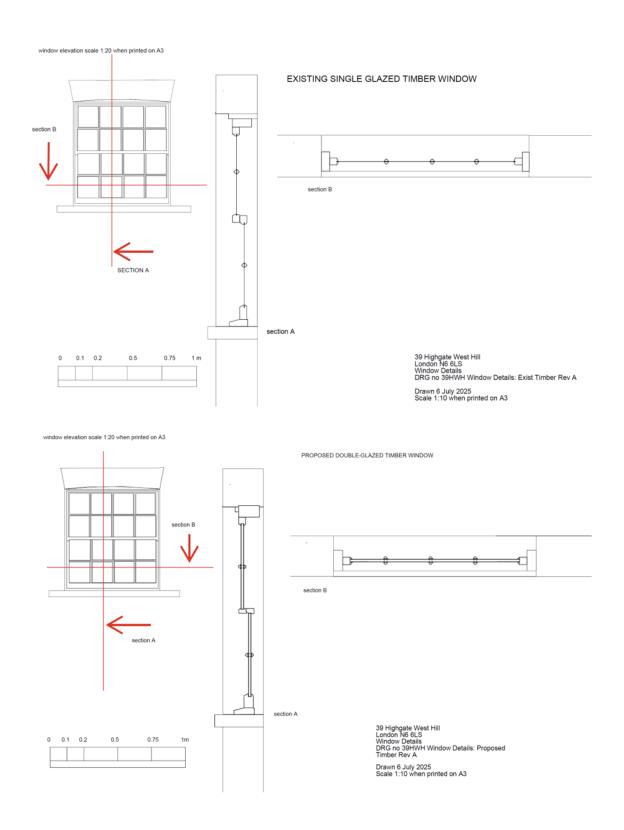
Existing and proposed window section of the timber window on southwest side elevation (Source: submitted documents)
